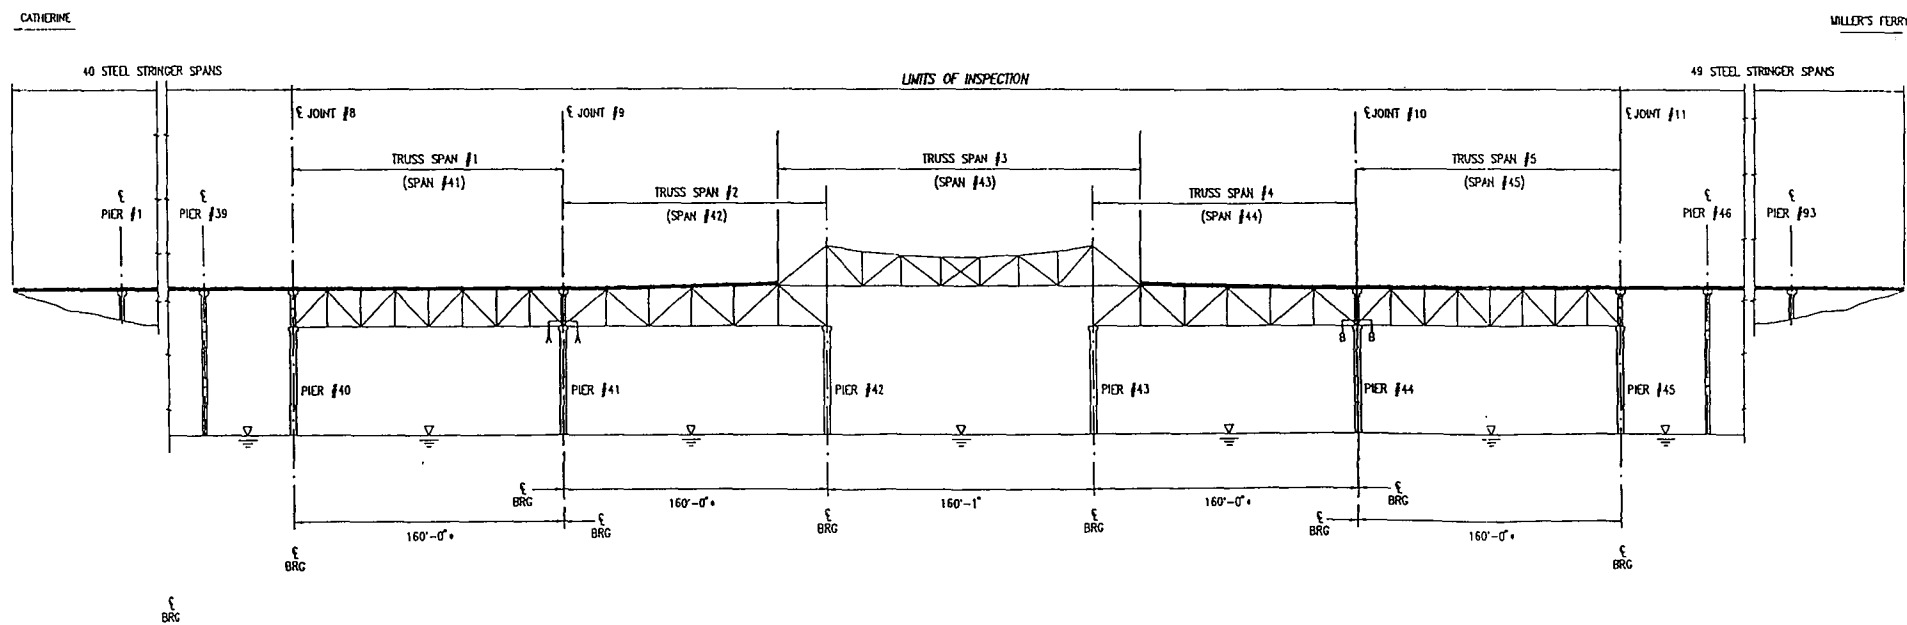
South Elevation of Millers Ferry Bridge (28-66-12.0)
